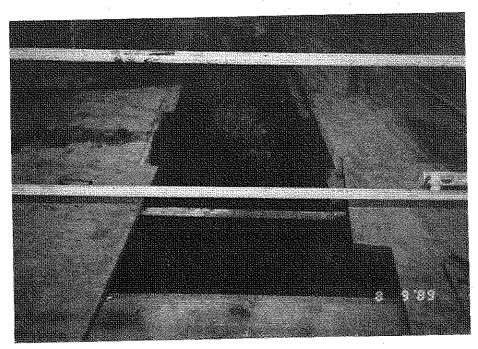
East view of Former Wood and Packaging Wastes Trench (SWMU 1).
